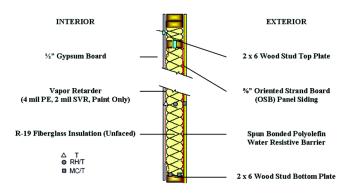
Occupied residence wall construction and sensor location—Olympia, Washington.
